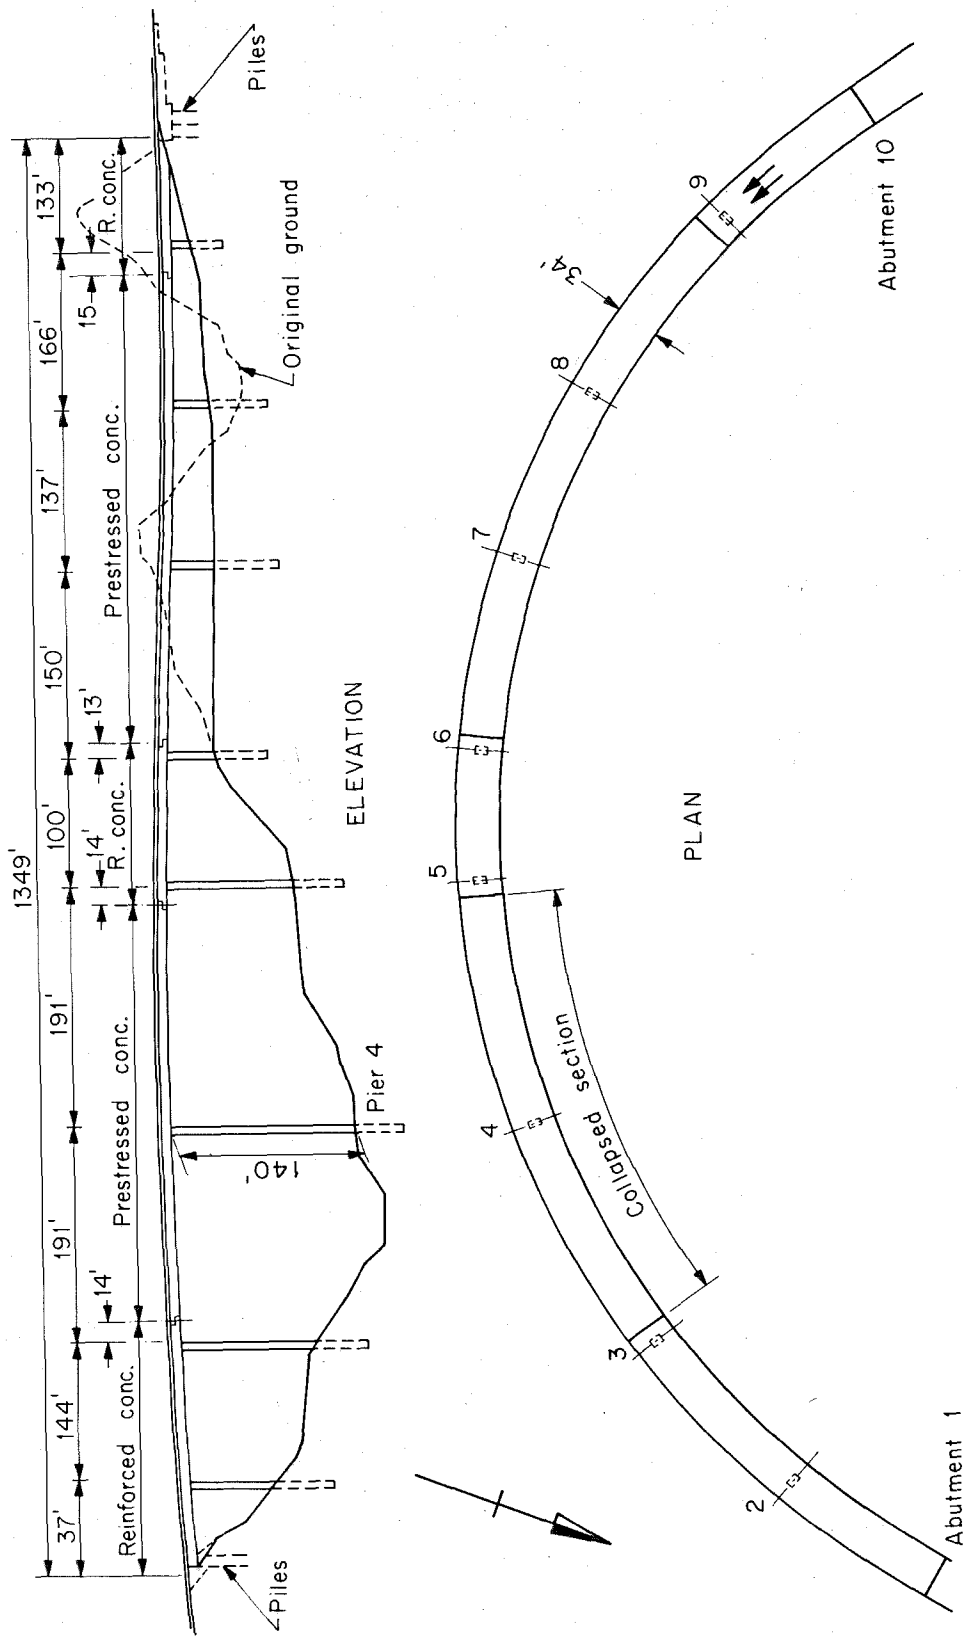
Details of collapsed structure, Golden State-Antelope Valley freeway interchange.
